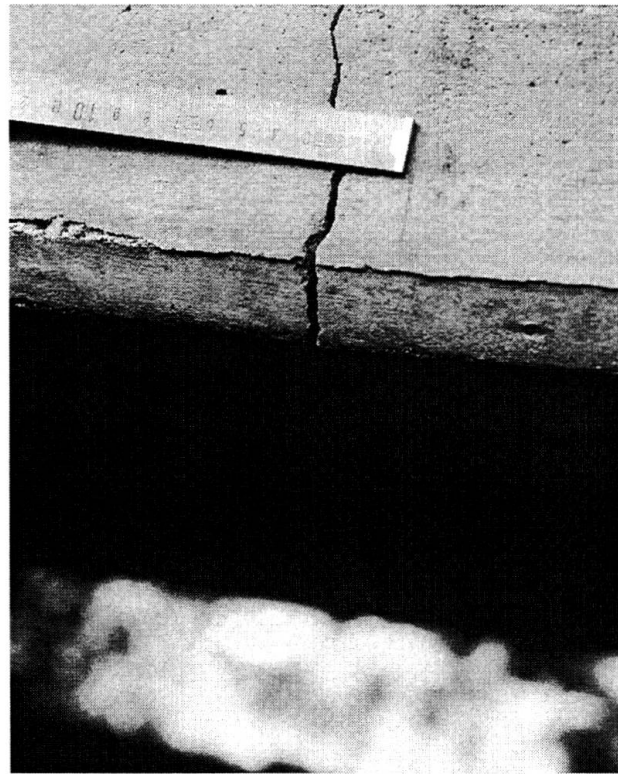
A Photo showing typical large cracks in RC beam of a bridge on TanZam highway.
